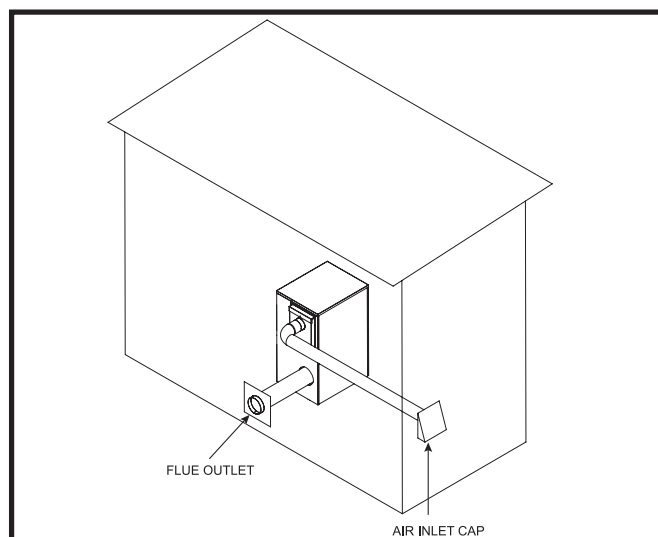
Horizontal DirectAire Installation with Sidewall Combustion Air in a Different Pressure Zone
